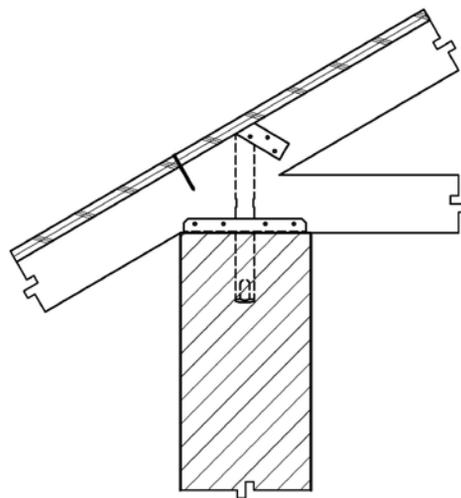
Masonry Wall Wood Framed Eave, No Eave Blocking.
